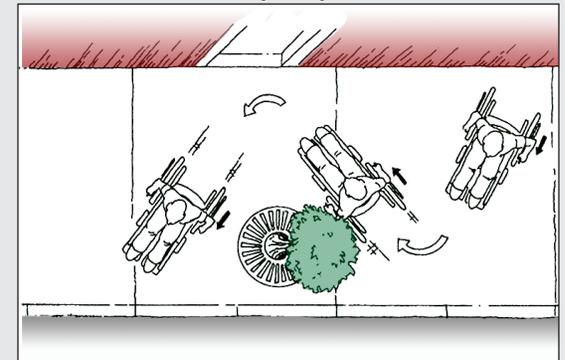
Typical Landing Area with Adjacent Rest Area
